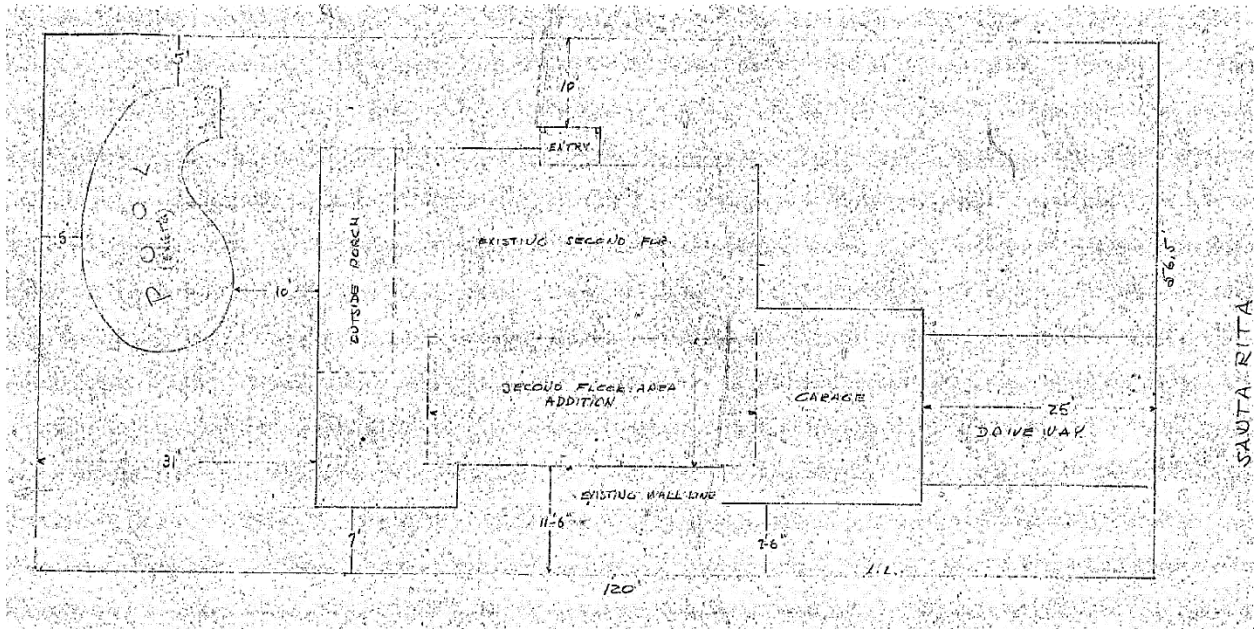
Site plan of 550 Santa Rita Avenue illustrating conditions prior to the 1973 addition.
